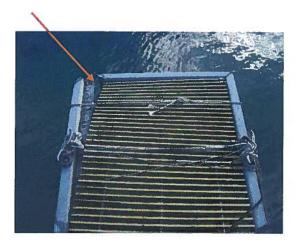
View of boat ramp's west walkway. Damaged end of the walkway to be repaired.
